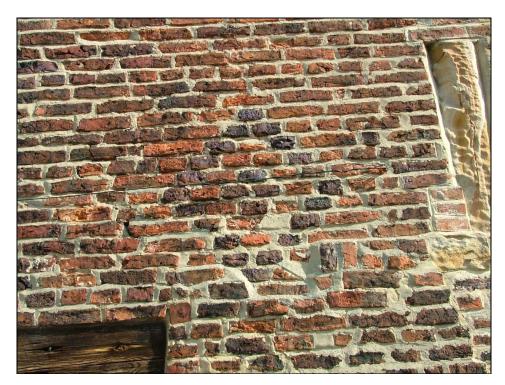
Diaper work in the form of a diamond, west elevation of Farm Cottage
